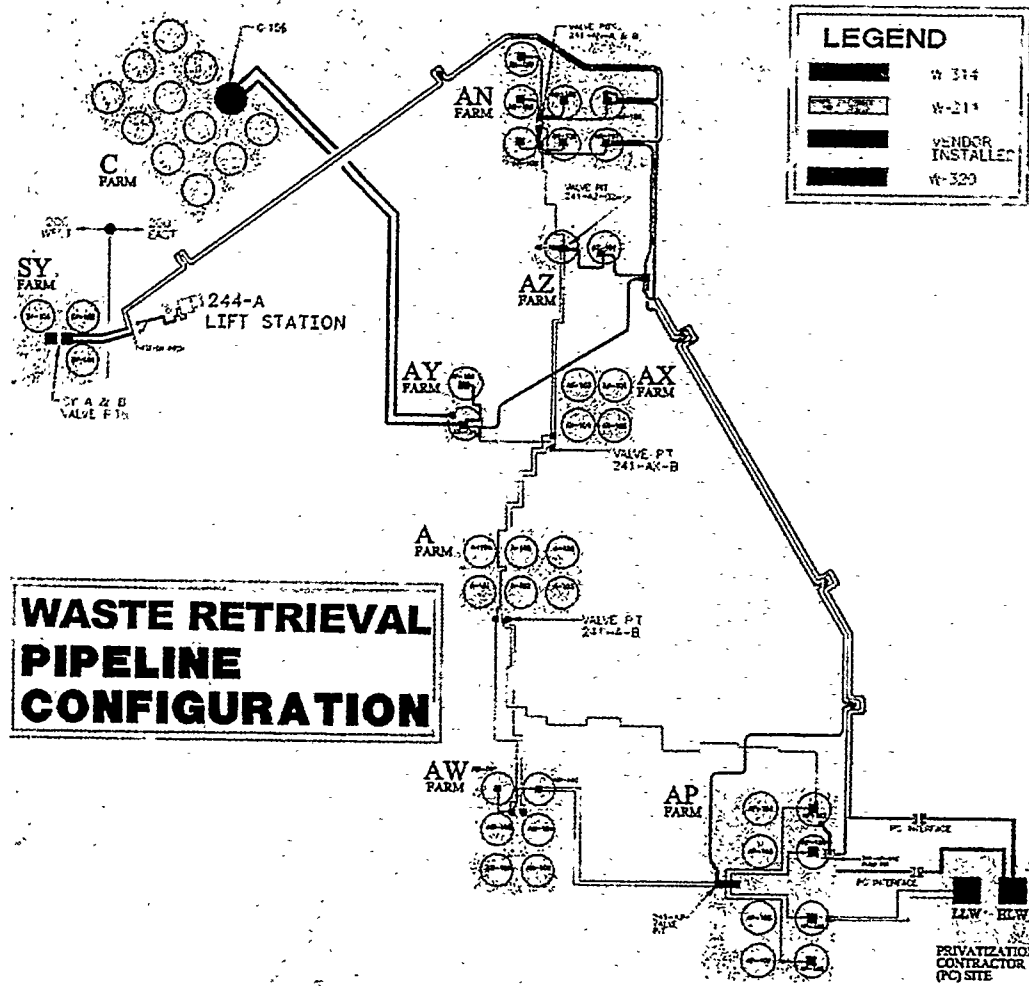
Tank farms and waste retrieval pipeline to privatization contractor site
